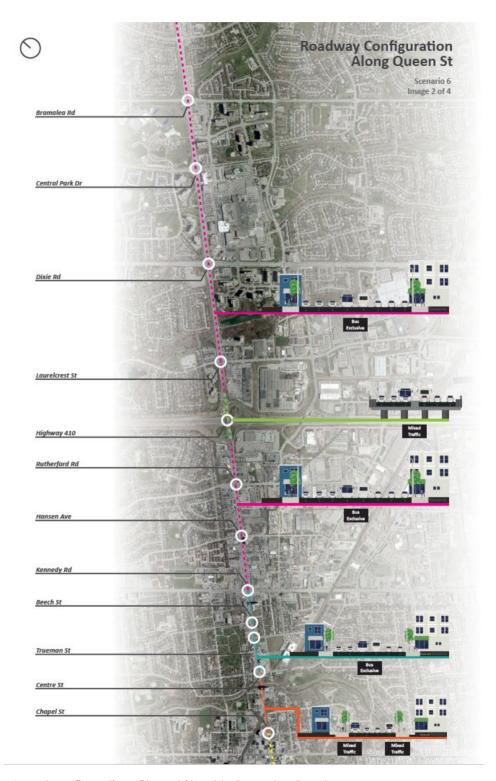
Scenario 6 road configuration, Chapel Street to Bramalea Road
